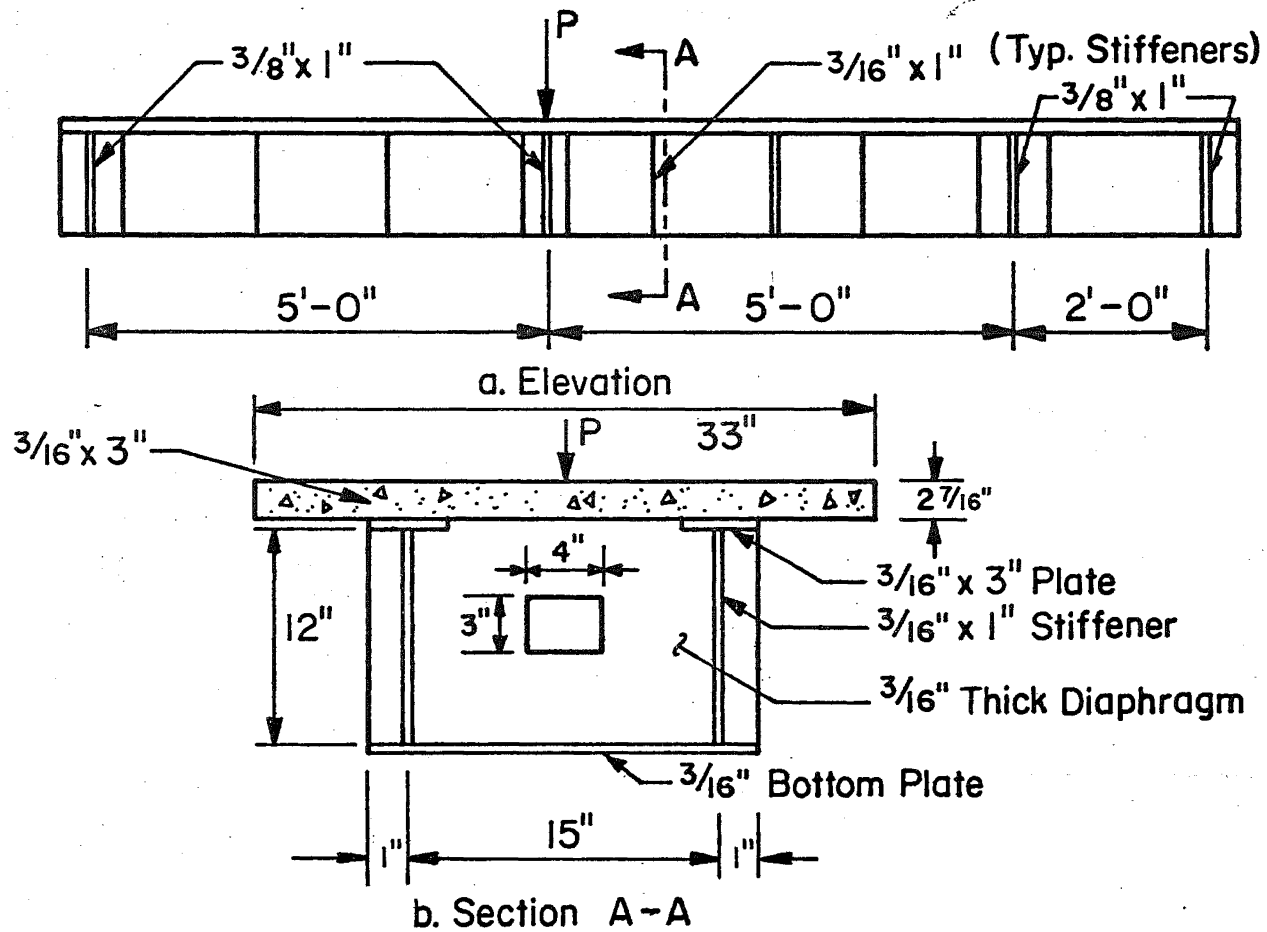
Composite Steel Box-Beam, Elevation and Section
